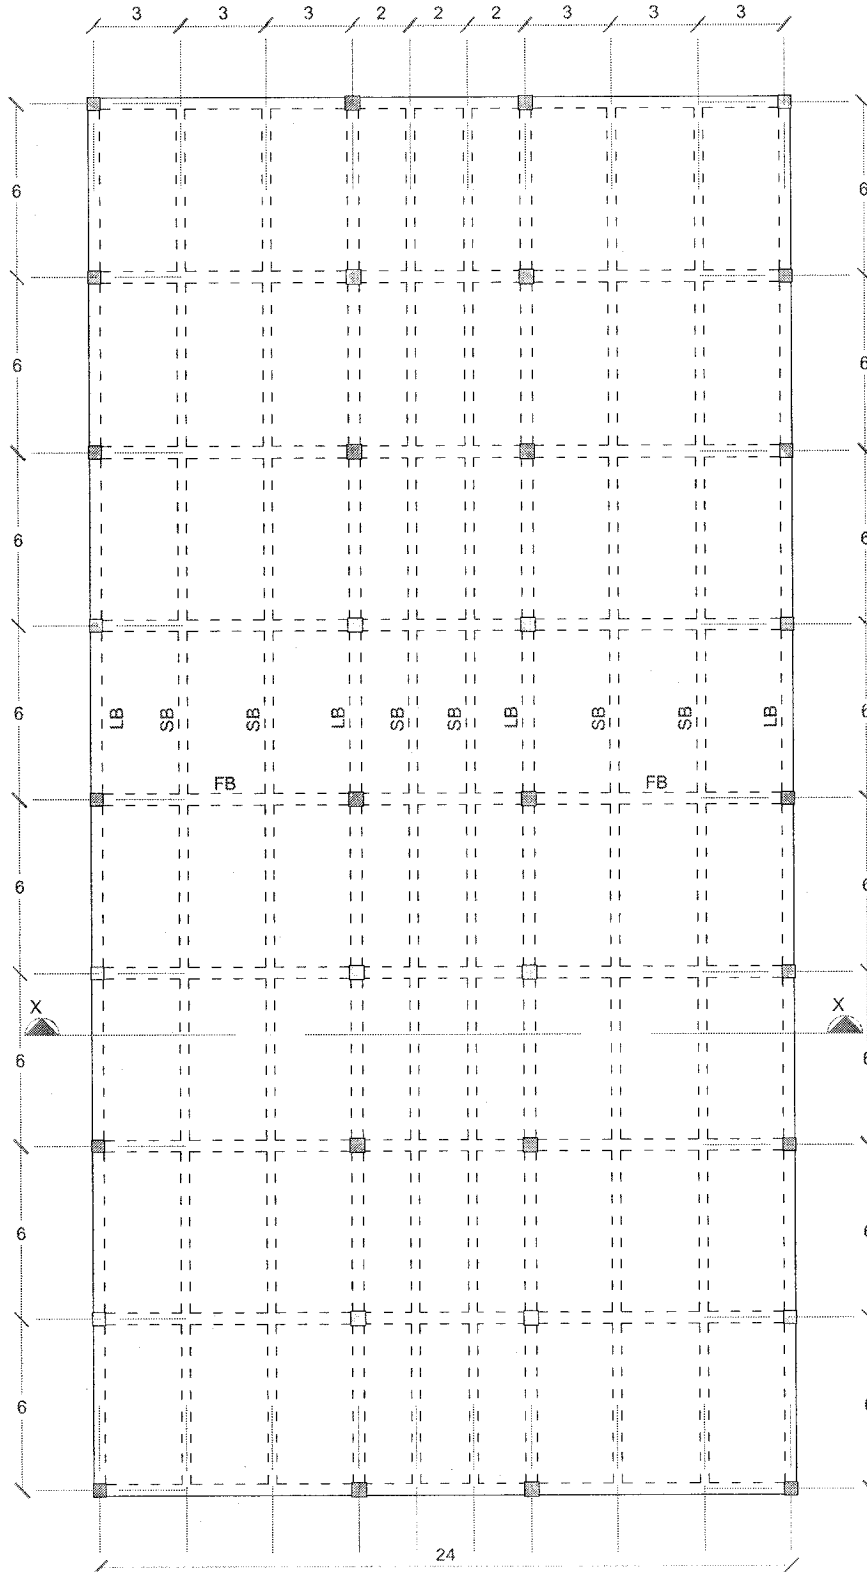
General Structural Plan (Dimensions are in Meters)
